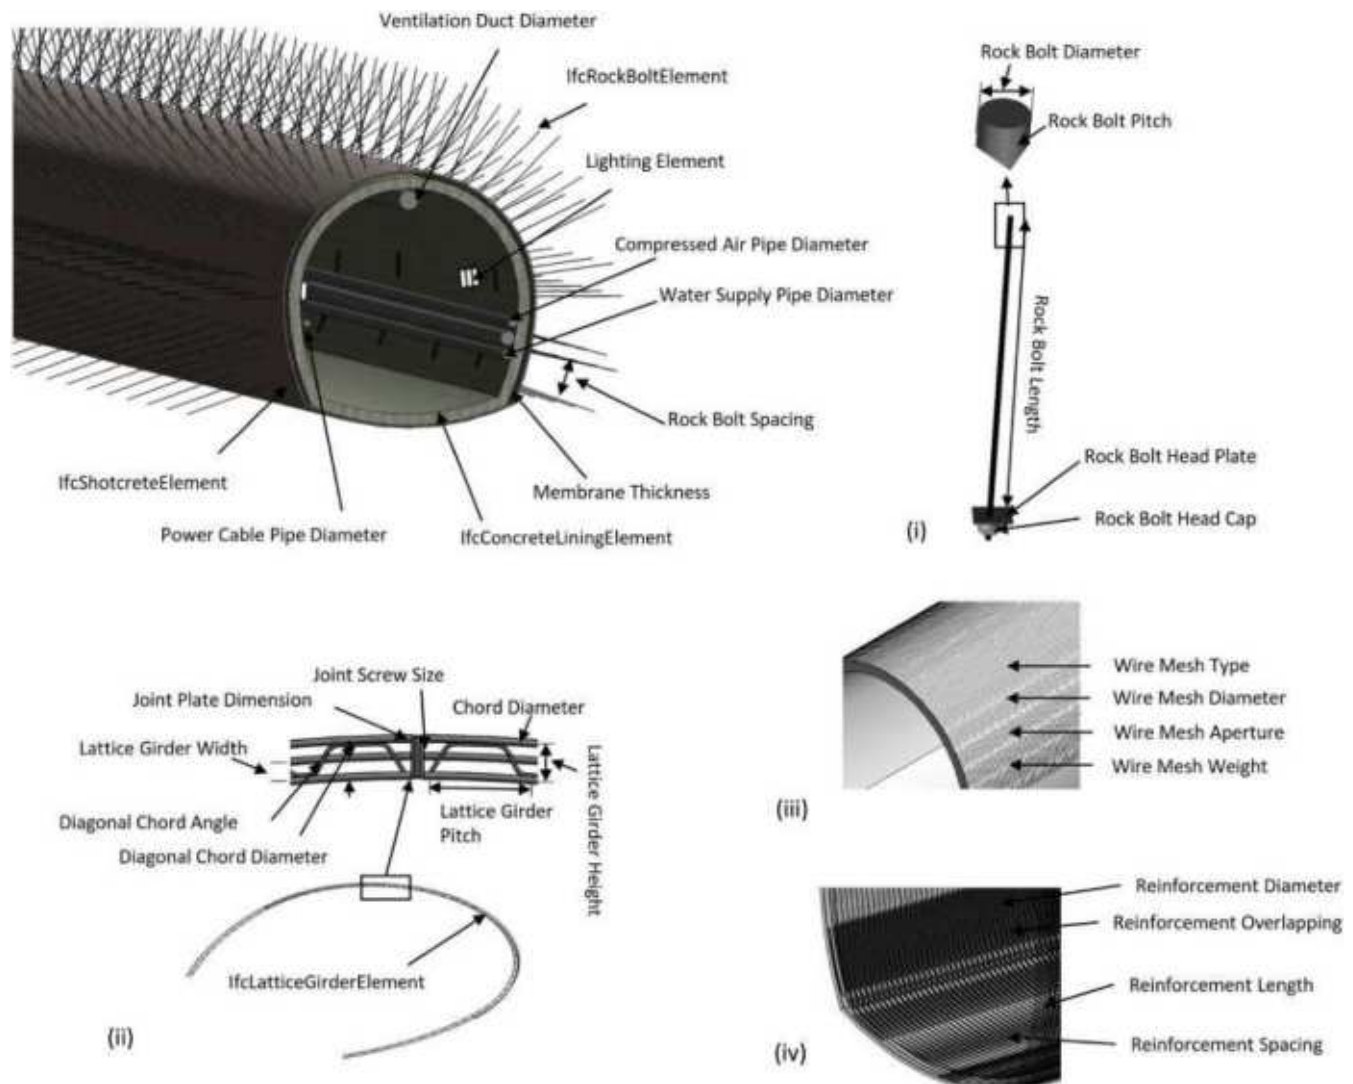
TIM intelligent model of the rock support models, and its components with extract of IFC-based drill-and-blast tunnel construction elements: (a) rock bolt; (b) lattice girder; (c) wire mesh; and (d) concrete reinforcement.
